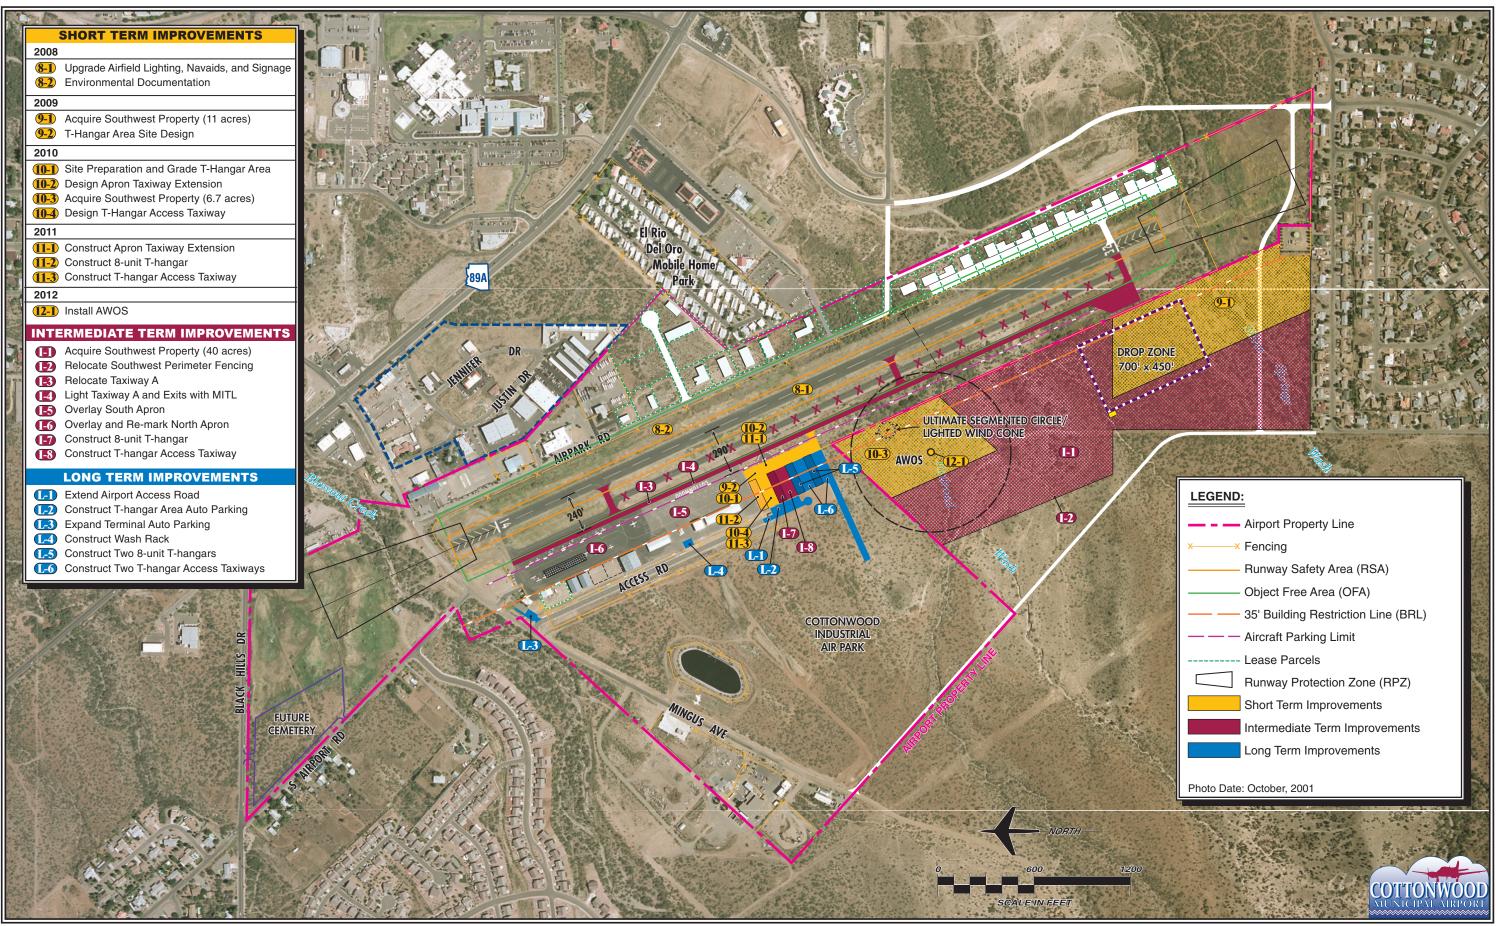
A PROPOSED IMPROVEMENT PROJECTS
